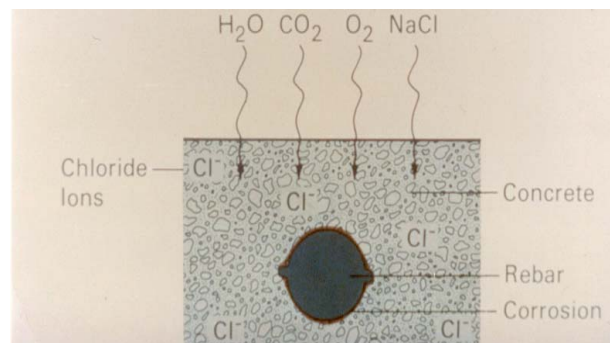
Diagram of reinforced concrete saturated with chloride ions.
